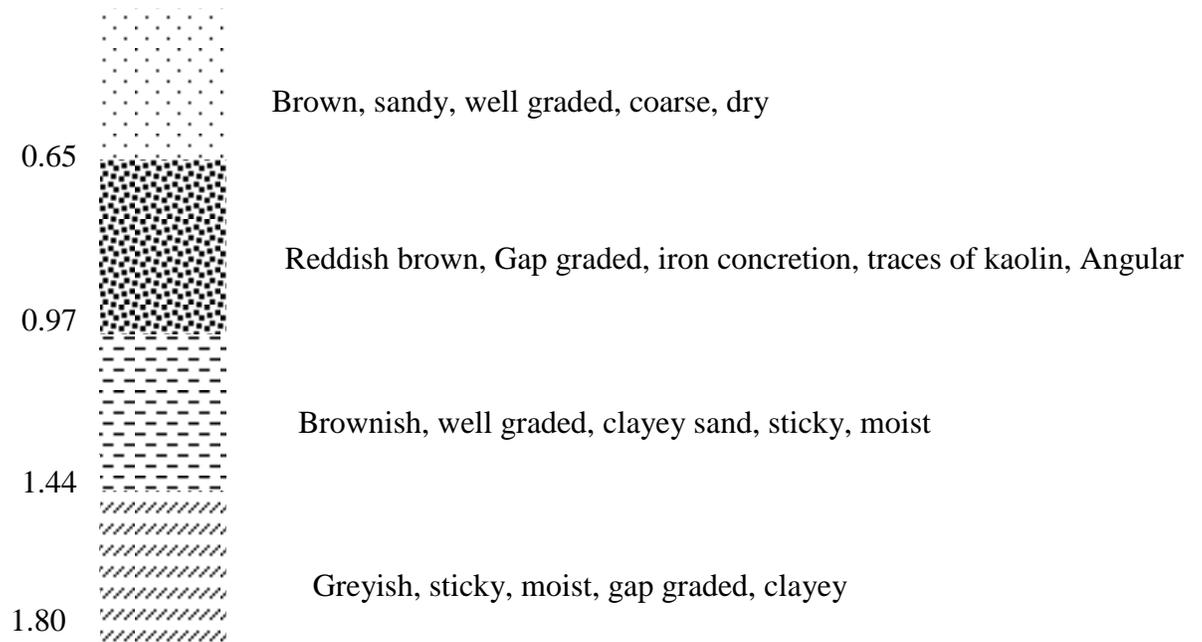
Typical Soil Profile at Lautech junction along the Road
